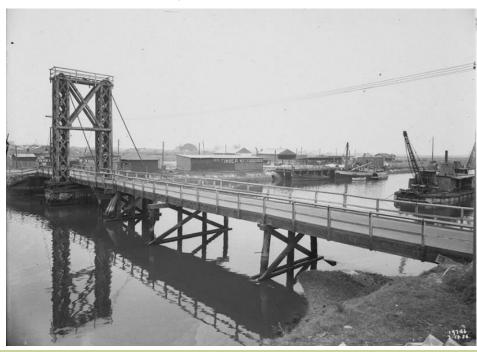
Bascule bridge Ricketty Street 1936 (Source: State Library of New South Wales [d1\_25231/GPO1 25231])
